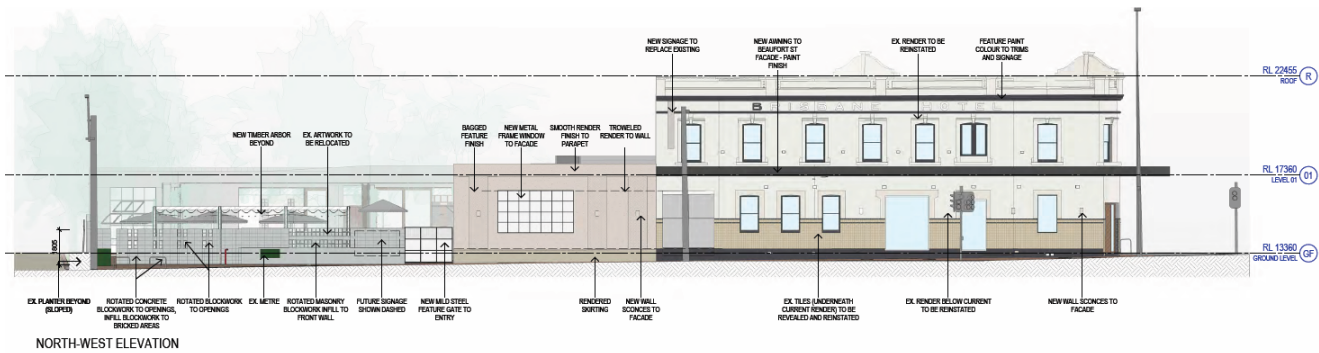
Beaufort Street Elevation Source: Woods Bagot
